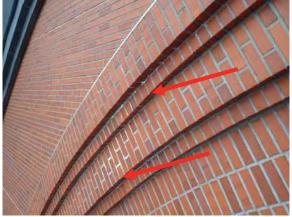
View of moisture-absorption related efflorescence observed on mortar surface and brick masonry cladding at archway detail brick.
